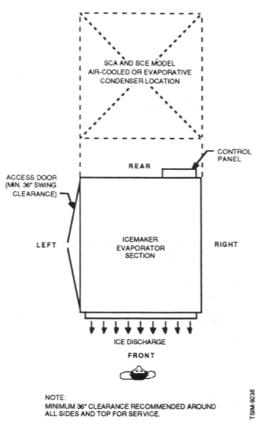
Typical Icemaker Layout (C-Series – 3 to 7 Ton Models)
